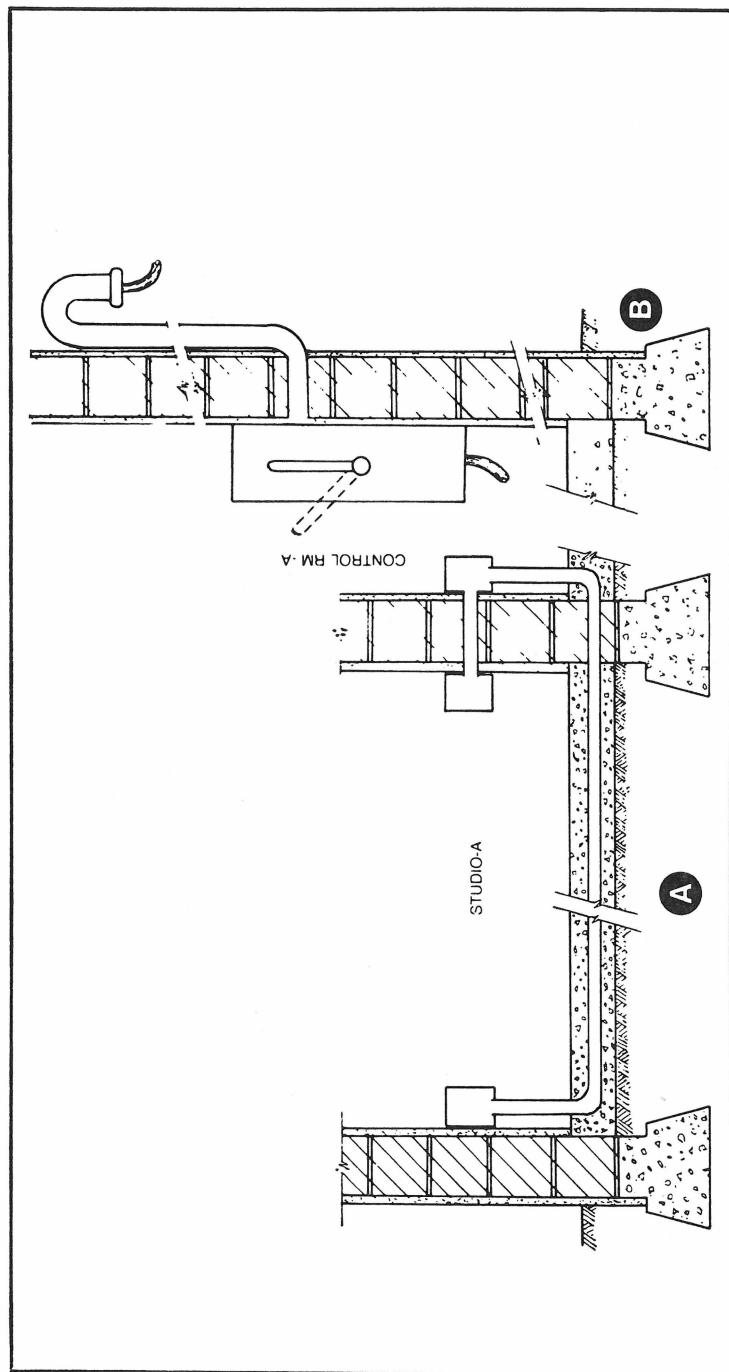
(A) Duct runs layed before the concrete floor is poured provide separate ducts for television and audio use. (B) Electrical switch box arrangement for energizing portable cable runs for all set lighting. House lights are handled in the conventional way.
